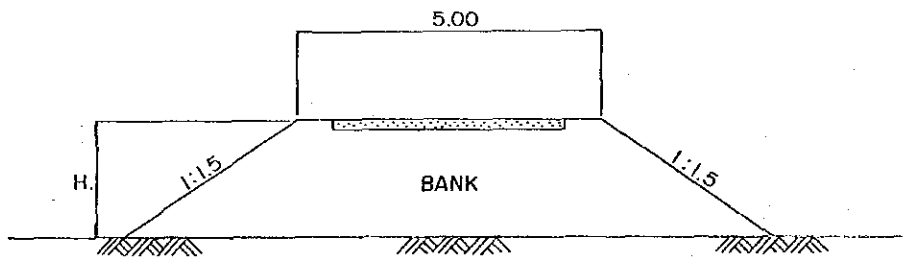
RURAL ROAD IMPROVEMENT PLAN
